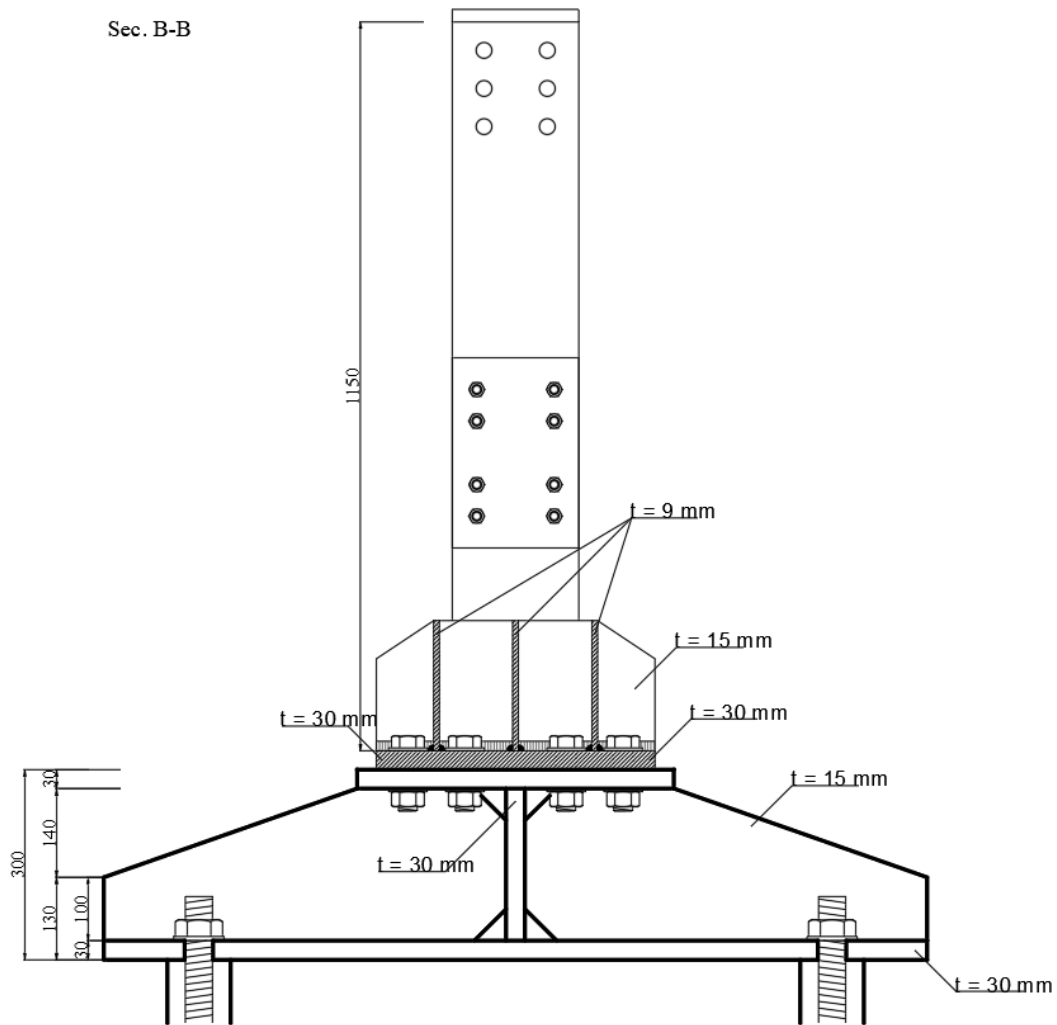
Detail of the base plate in side view (dimensions in mm)
